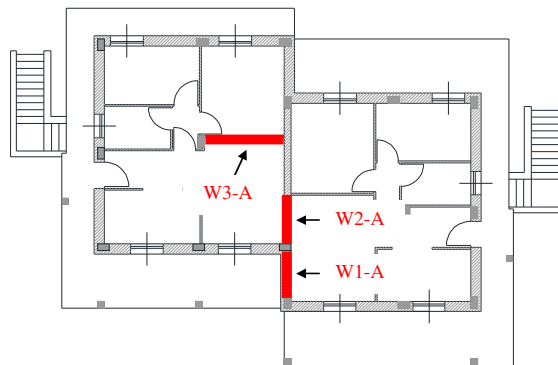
Layout of the infill walls tested at the ground floor of Building 2.
